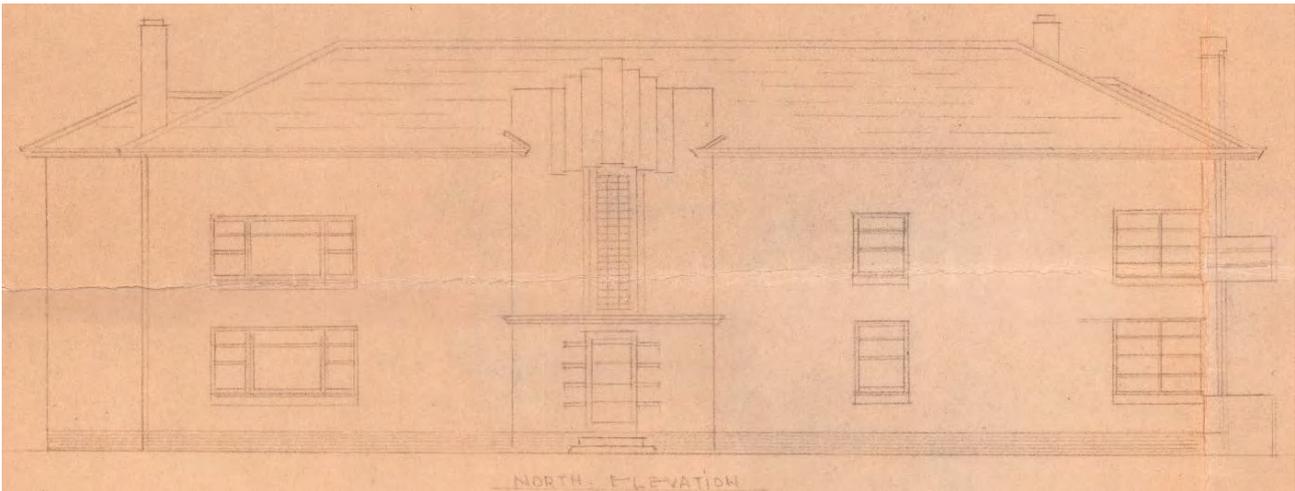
Original drawing, north side elevation of 58A Westbury Street. (Source: Council building file)
